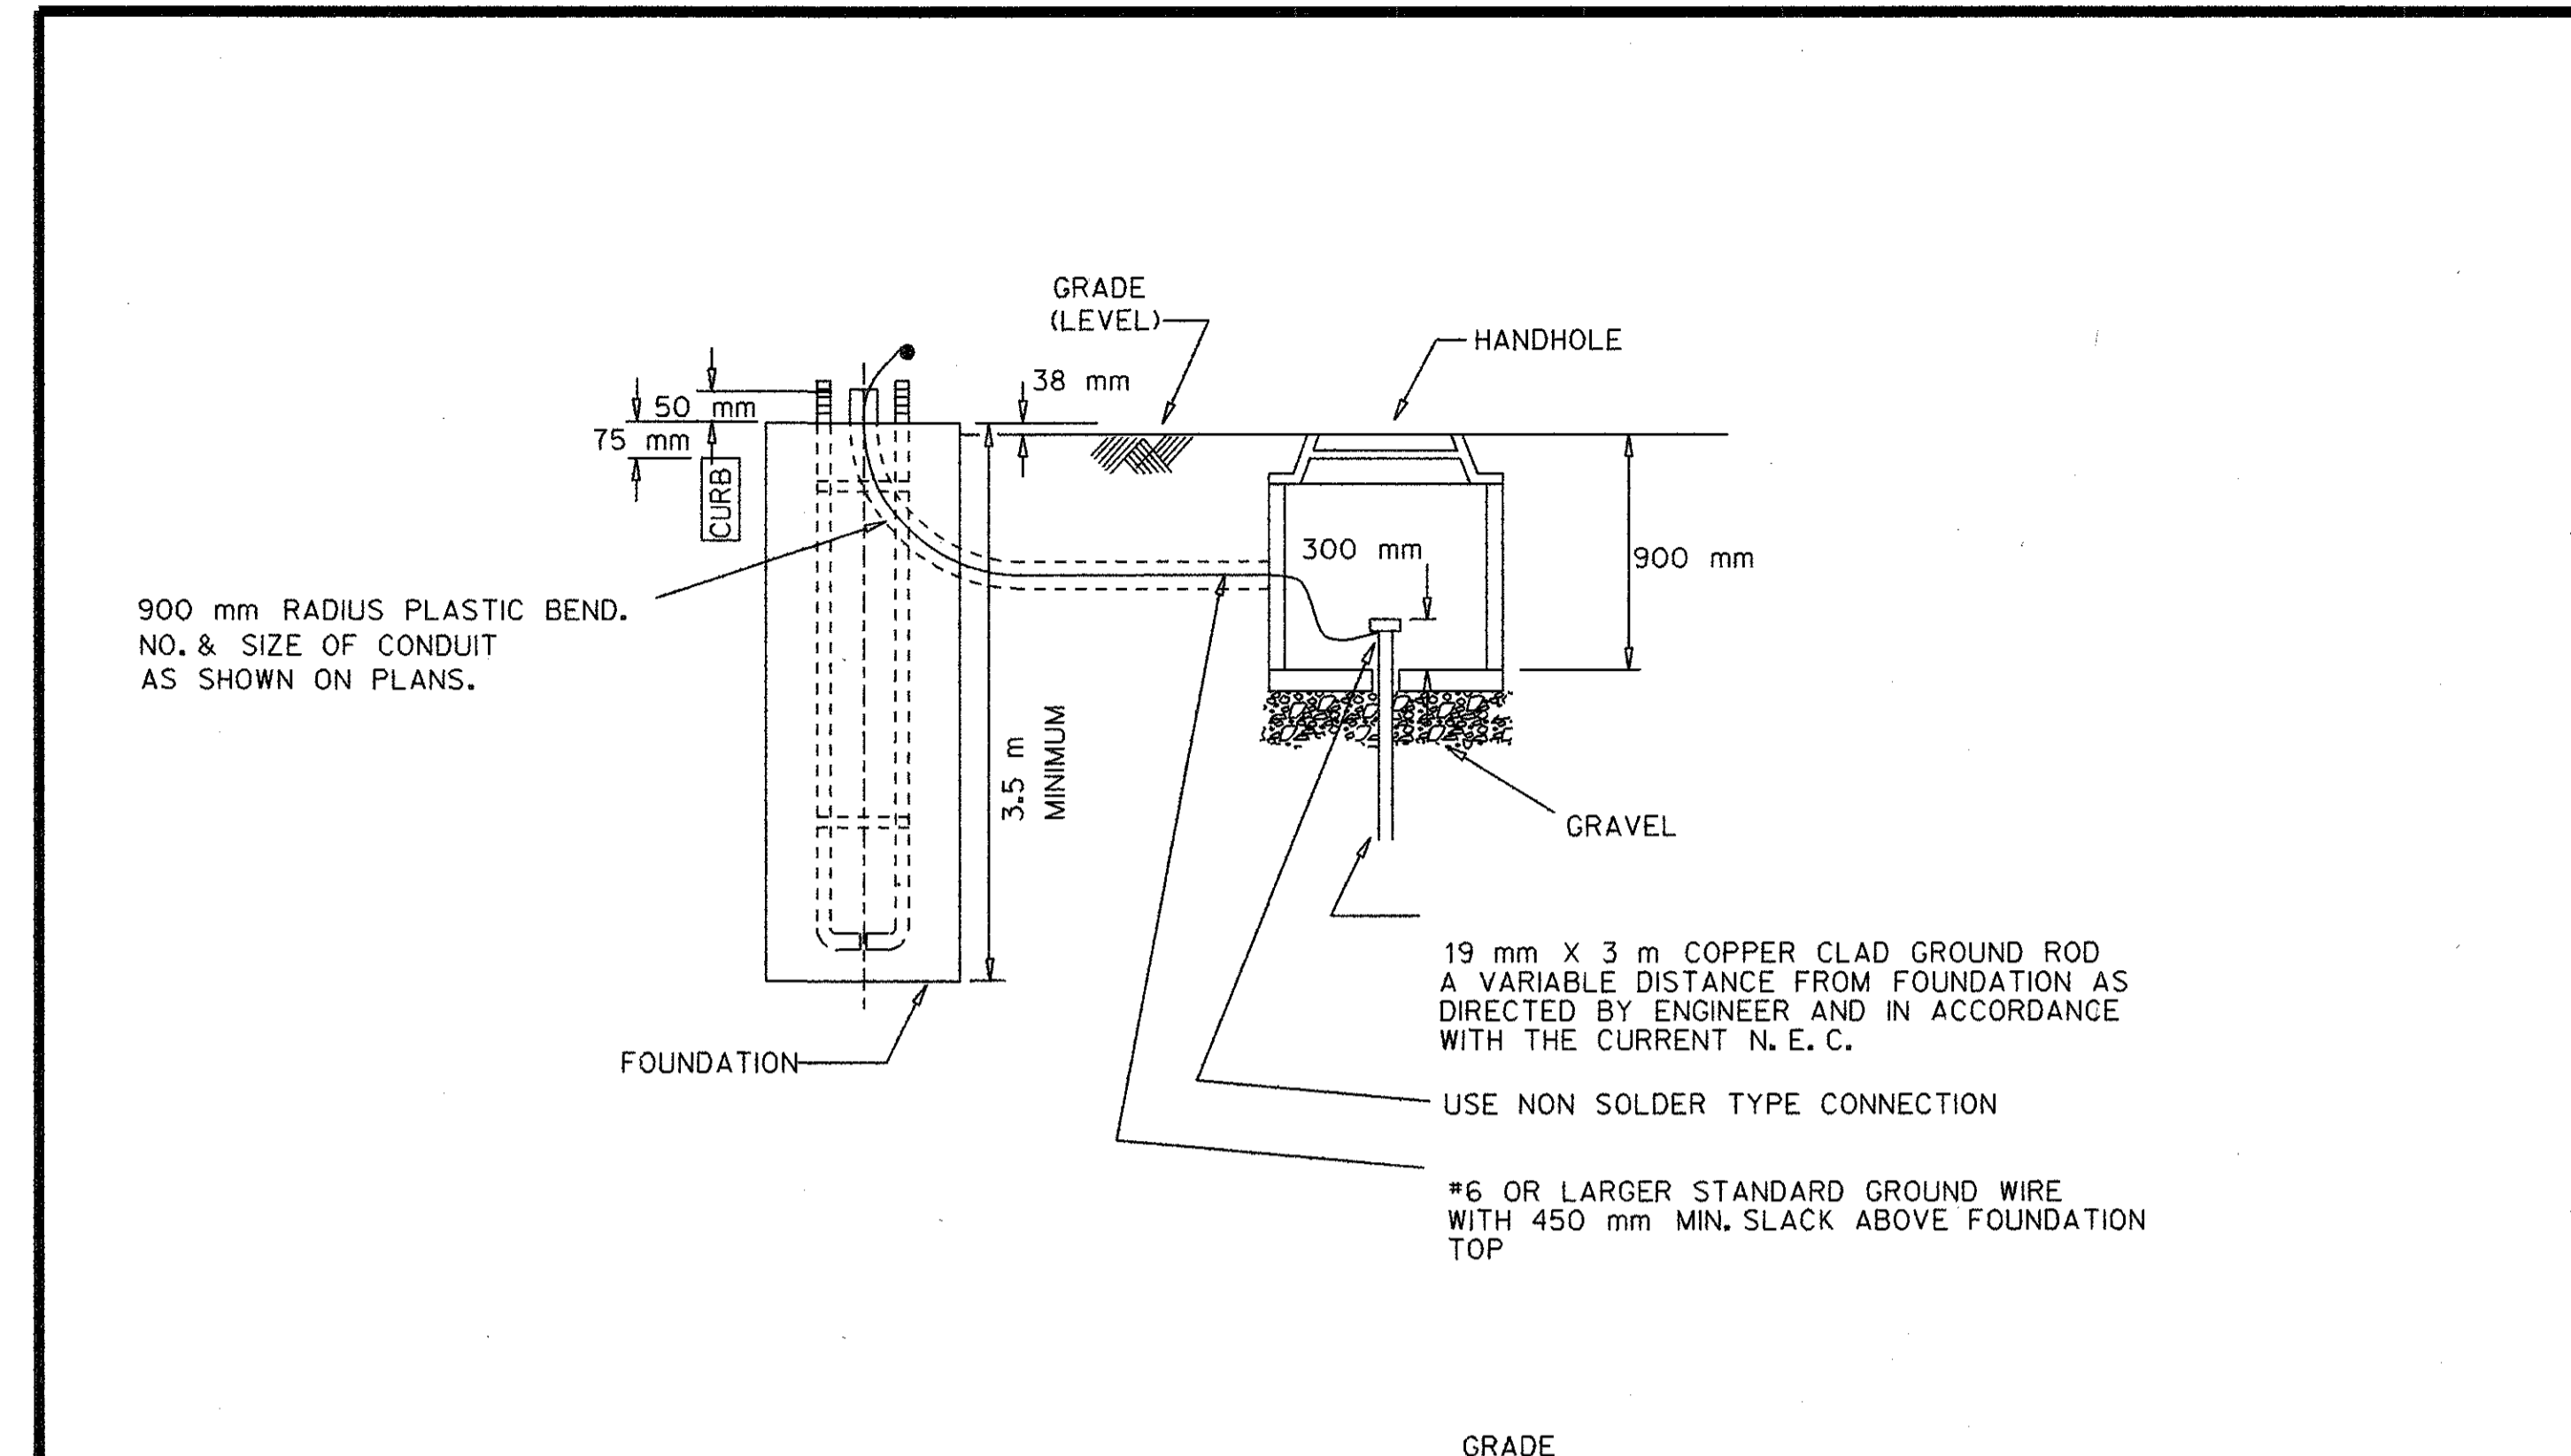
DETAIL : ANCHOR BASE STEEL STRAIN POLE FOUNDATION
